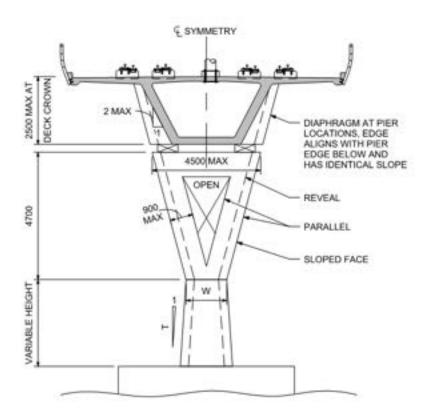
A: 87 Avenue Elevated Guideway Section – Box Girder (dimensions in mm)
